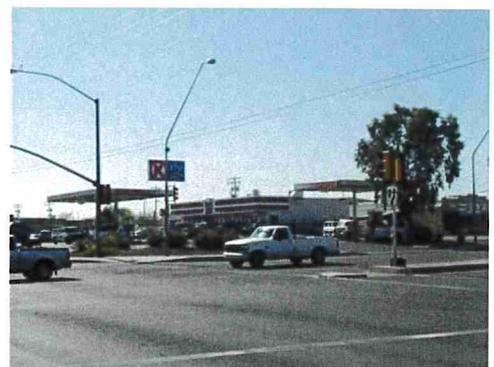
Looking southeast at the gas station on the northwest corner of Country Club and Ajo Way
